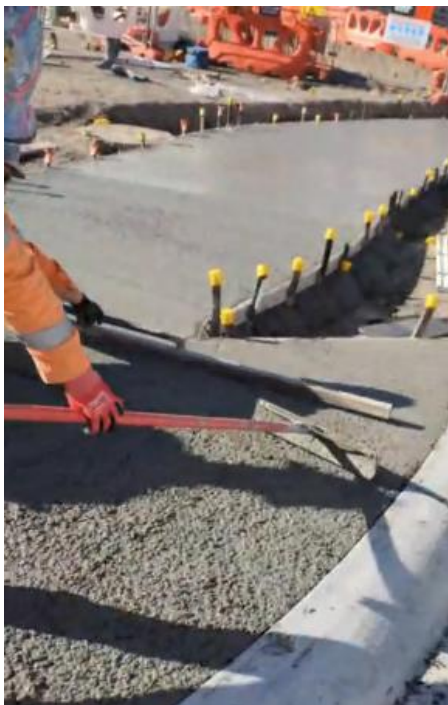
Concrete containing G360’s MKX being placed by Eifers as part of footpath pavement works in Newport, Melbourne.
